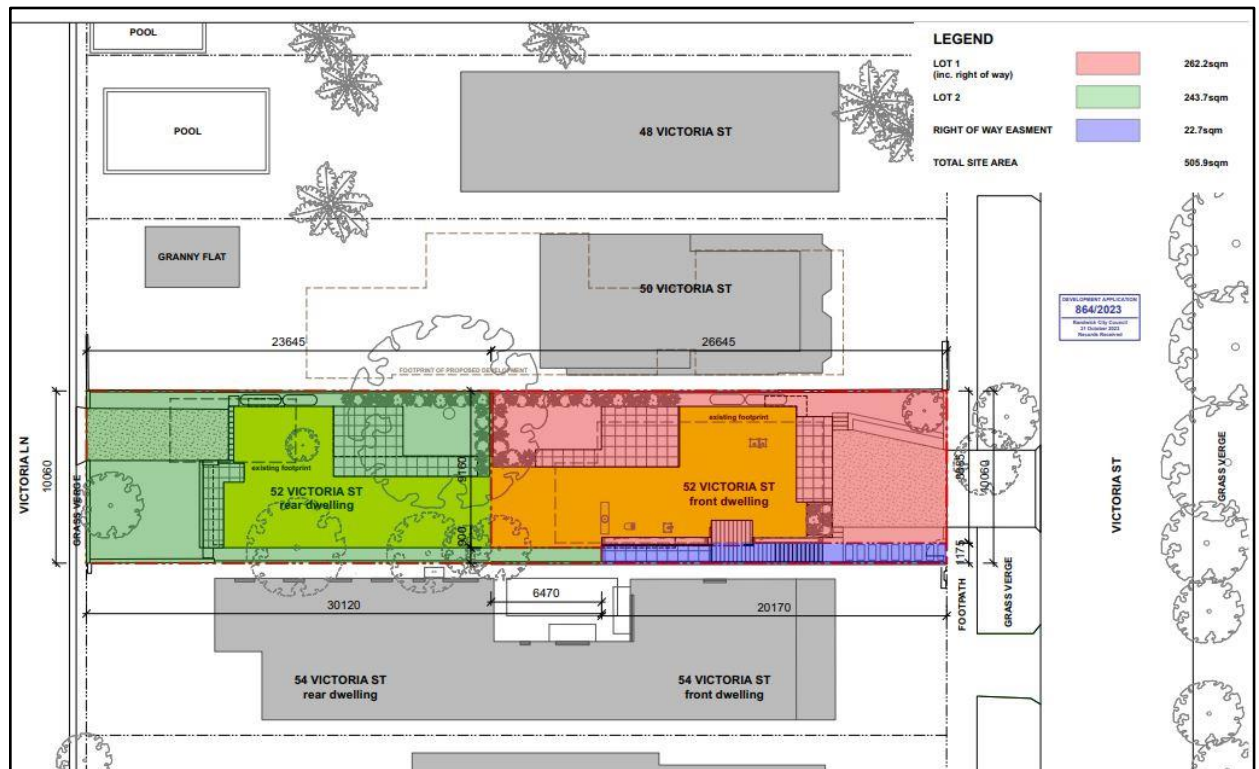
Subdivision layout & Area Plan (Source: Breathe Design)
